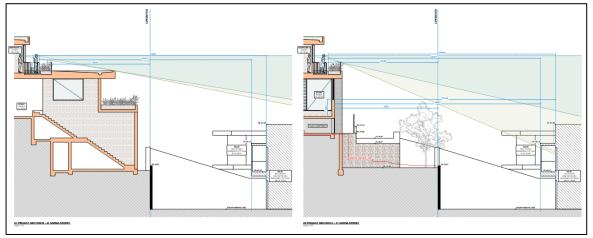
Privacy Sections from first floor level (Source: Baikie Corr Architecture).
